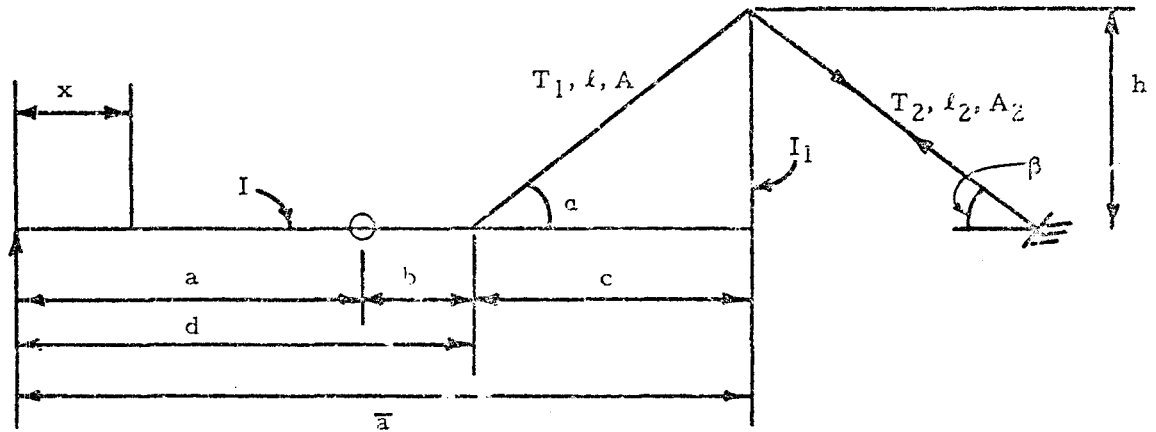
BRIDLE BRIDGE, ELEVATION VIEW
